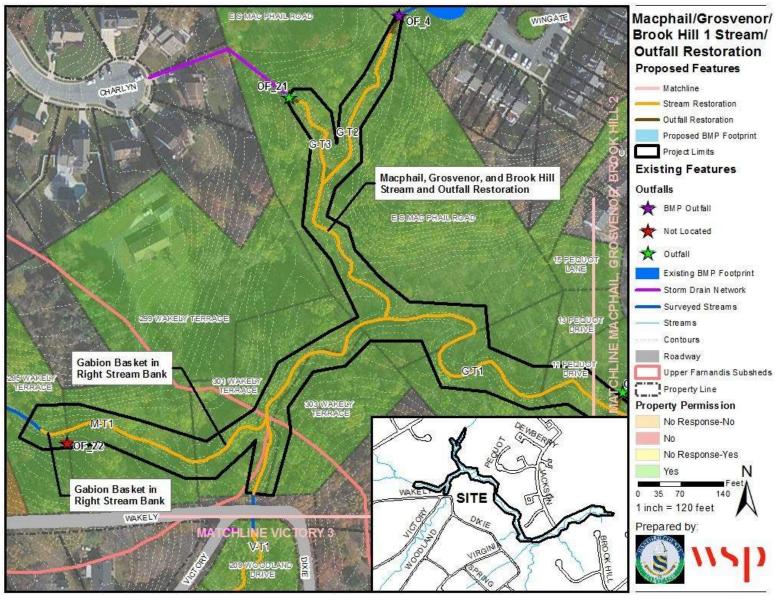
Site Location and Proposed Project Plan for Grosvenor and Brook Hill Stream and Outfall Restoration (Sheet 1 of 3)
